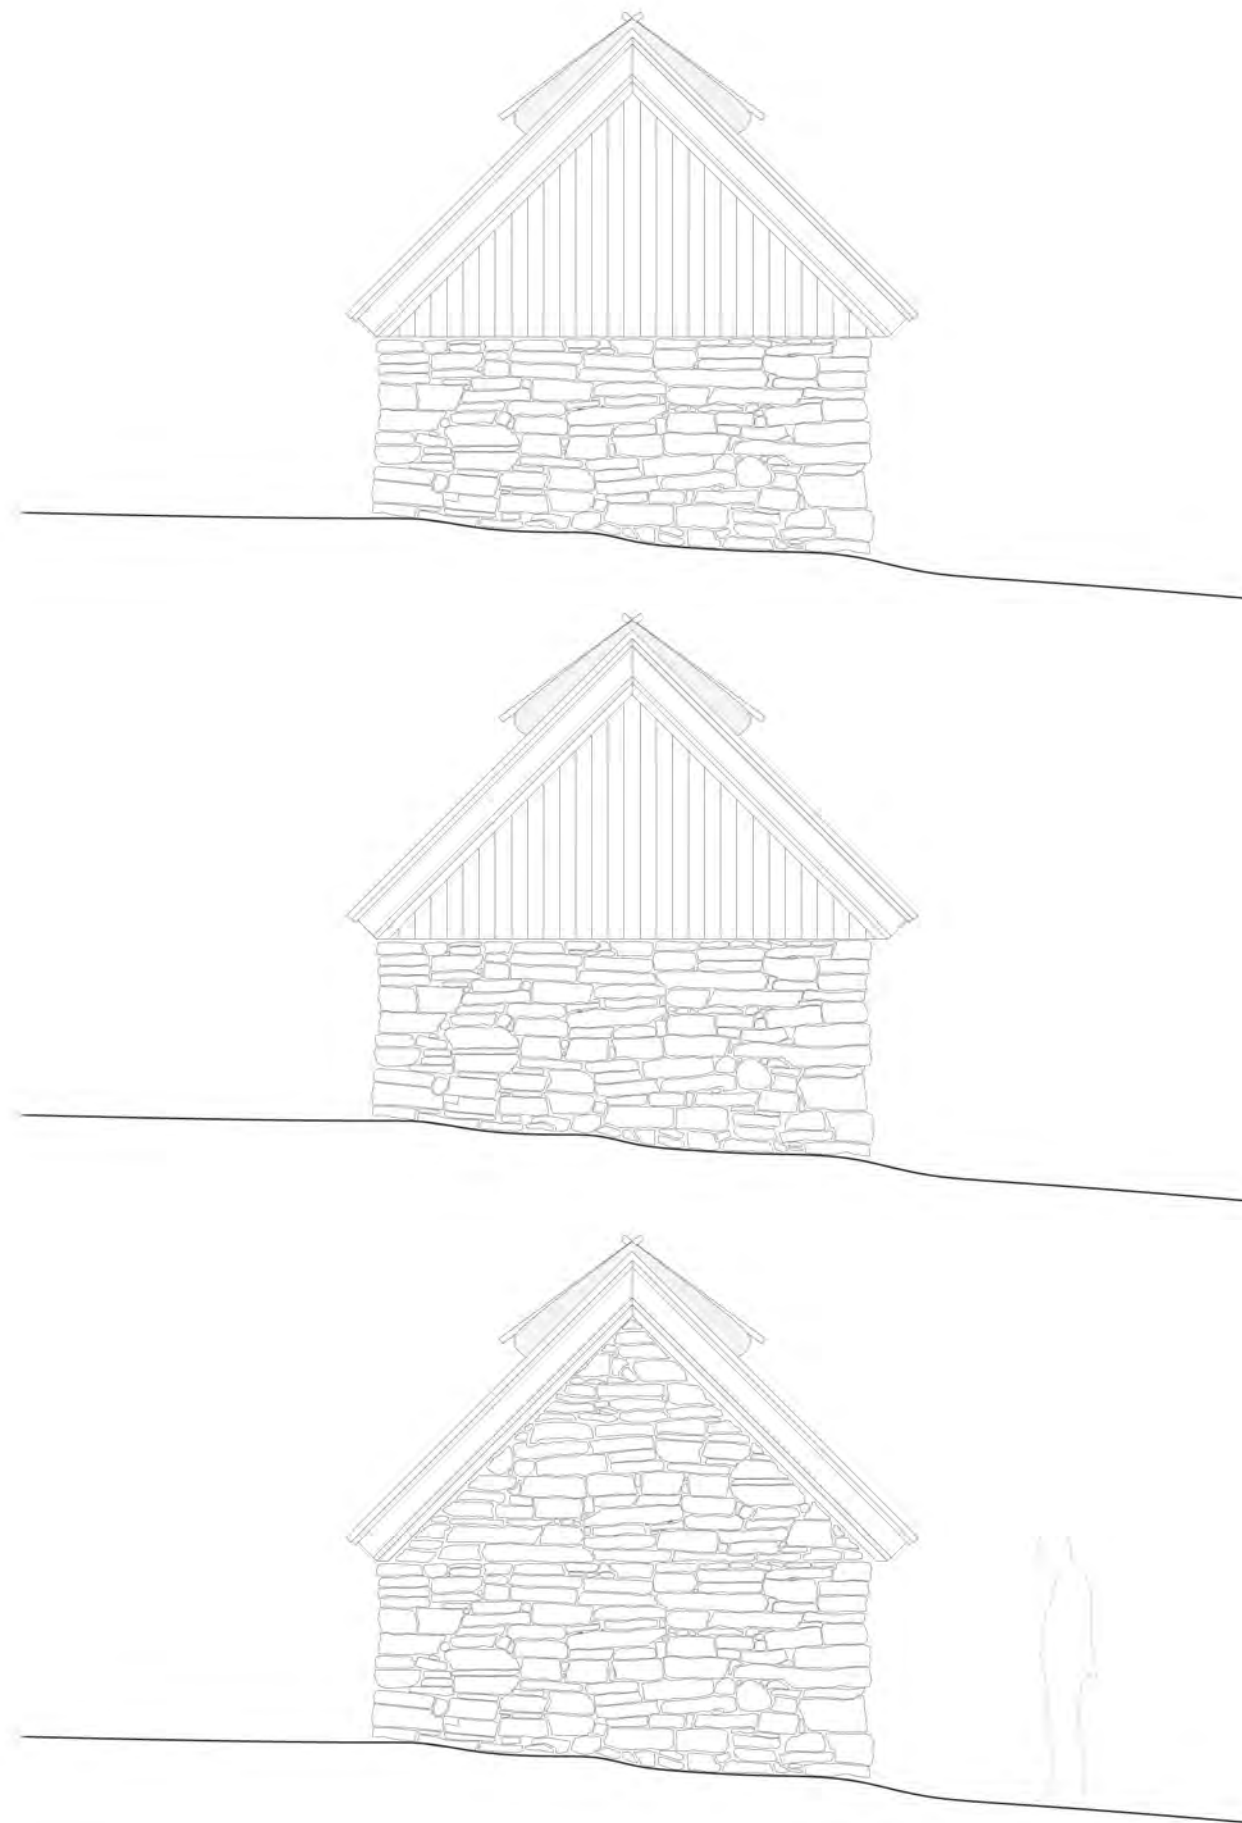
Diagrams of built assemblages made from dry stone walls found along the Stone Coast
